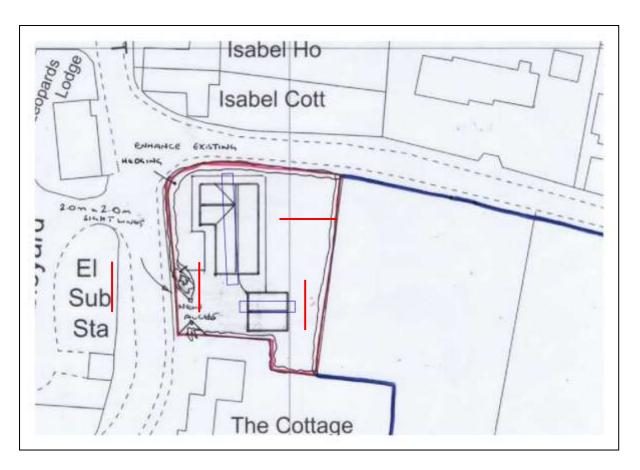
Site development plan showing proposed locations for evaluation trenches in blue (provided by client).
